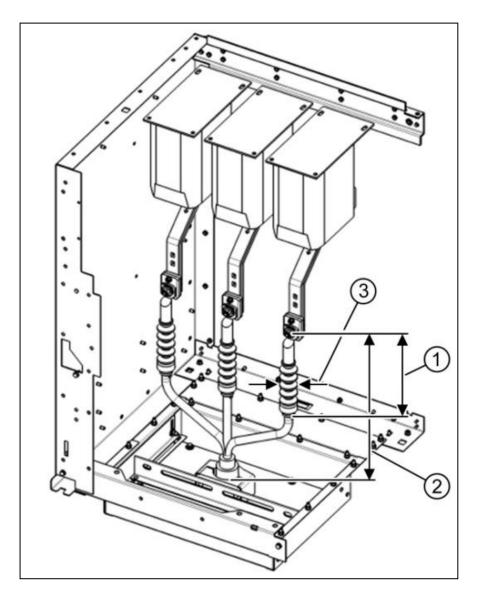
Dimension of three-core cable, view from the rear side of the panel
